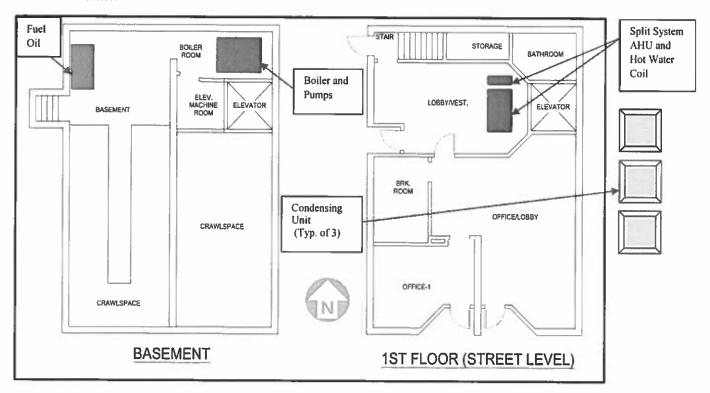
A: Worcester County Tourism Building - Keyplan (No Scale)
